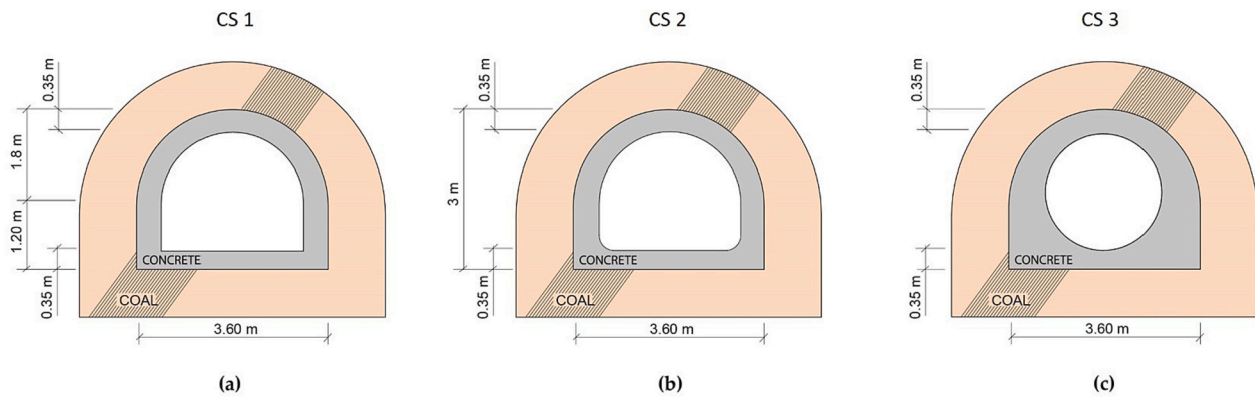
Existing cross-section of mining drift and variants of concrete lining: (a) Horseshoe-shaped concrete lining; (b) horseshoe-shaped concrete lining optimized; (c) circular-shaped concrete lining.
